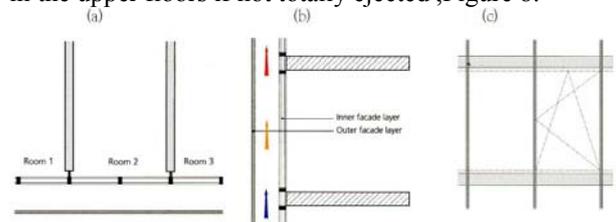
Multistory DSF: Plan (a); section (b) and elevation(c) (Osterle, 2001)
